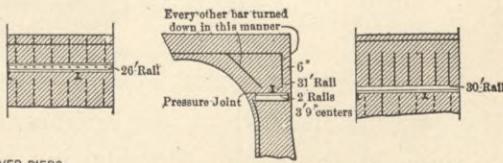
DETAILS OF ARCHES IN APPROACHES: THEBES BRIDGE
